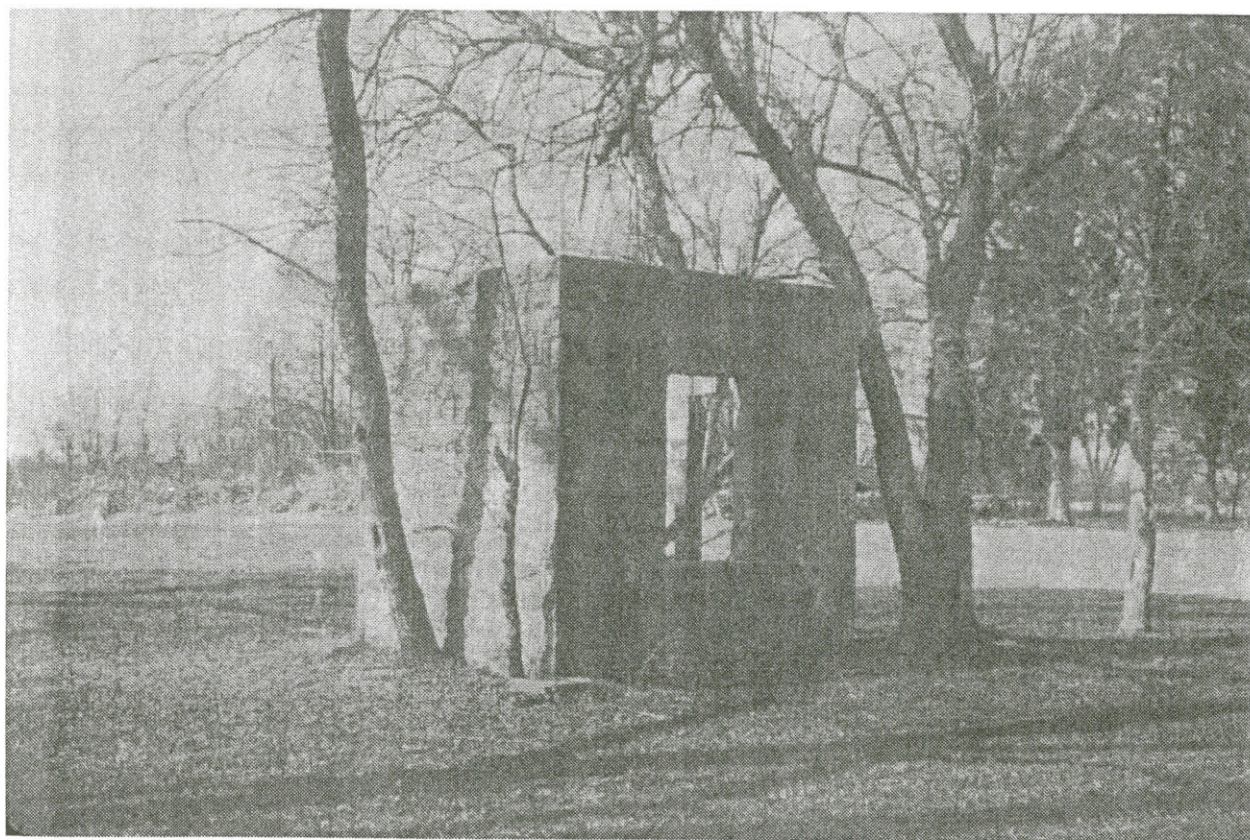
Jehu M. Reed Farm, view of north and east elevations of concrete block outbuilding, looking southwest.
